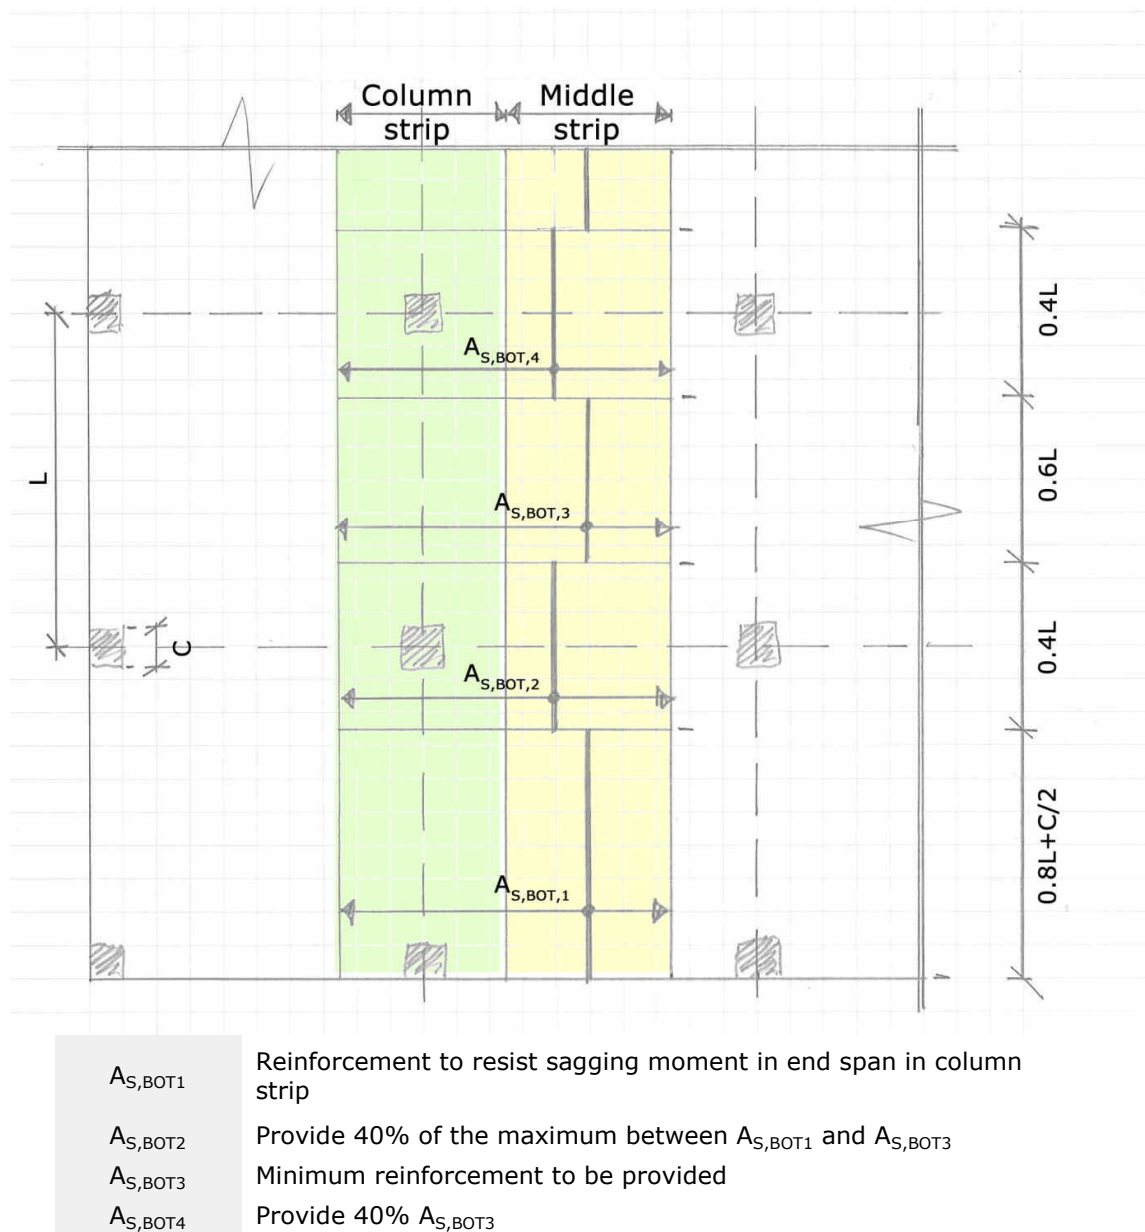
Plan view of slab summarising the detailing method used for bottom reinforcement
